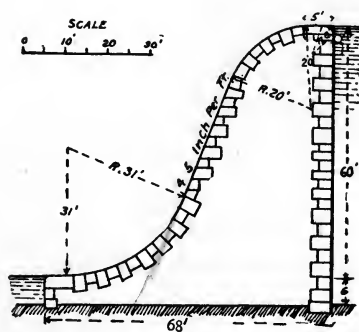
CROSS-SECTION OF COLORADO RIVER DAM.
